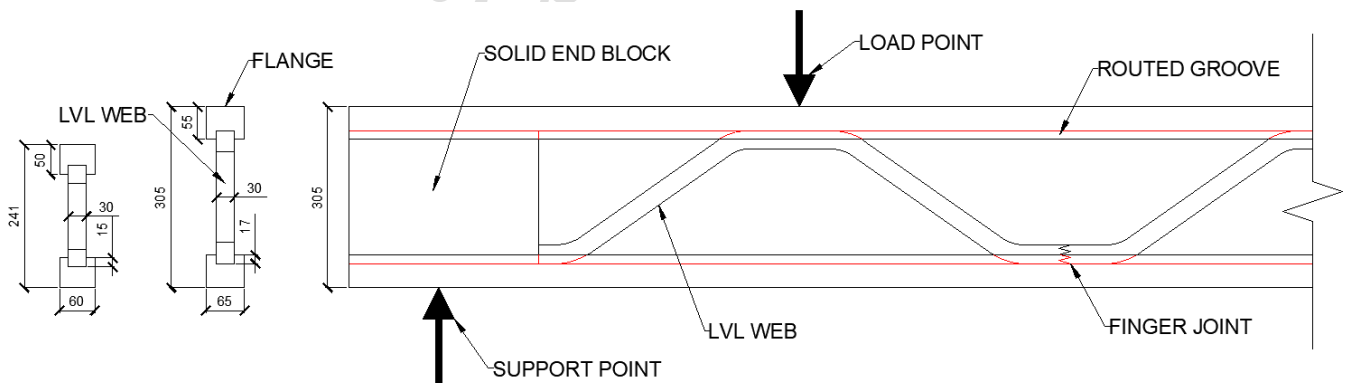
I-joist cross-section and lattice LVL I-joist components (Harte et al. [14]) (Dimensions in mm)
